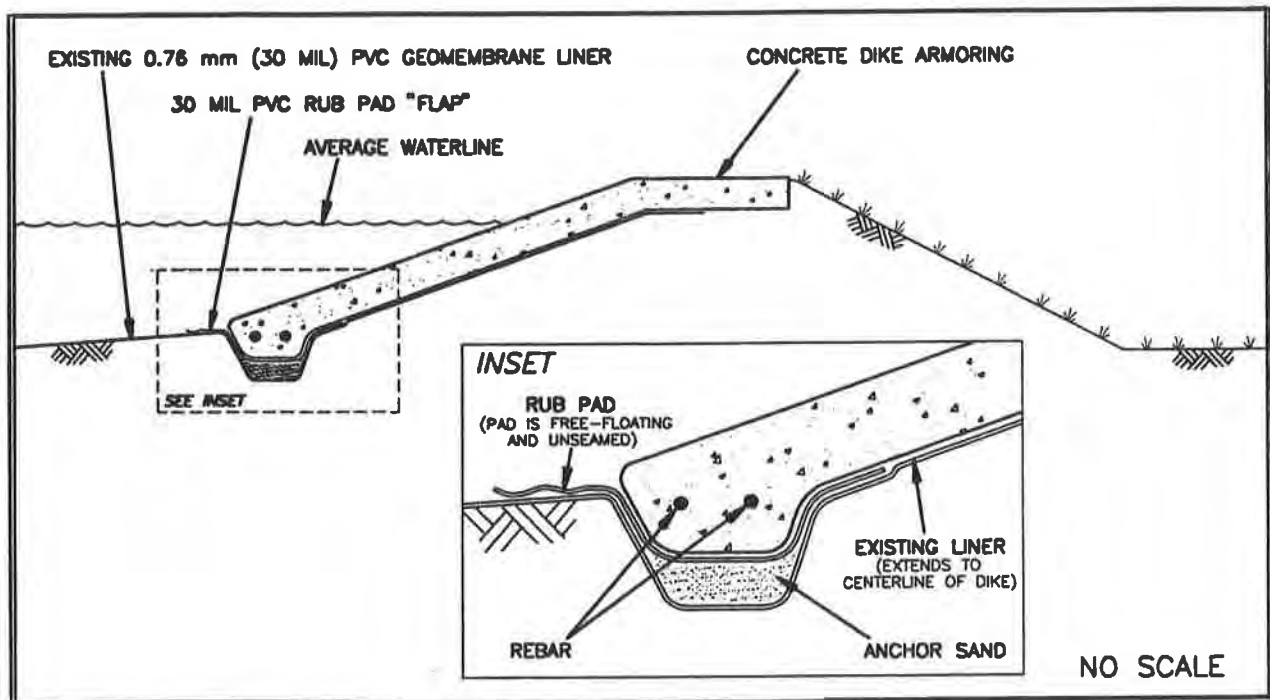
Typical Dike and Liner Construction (Source: ECT, 1994)
